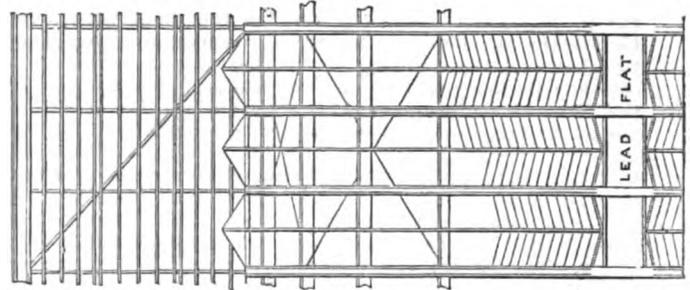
Half Plan of a 24 feet Bay of the Transept Roof.
